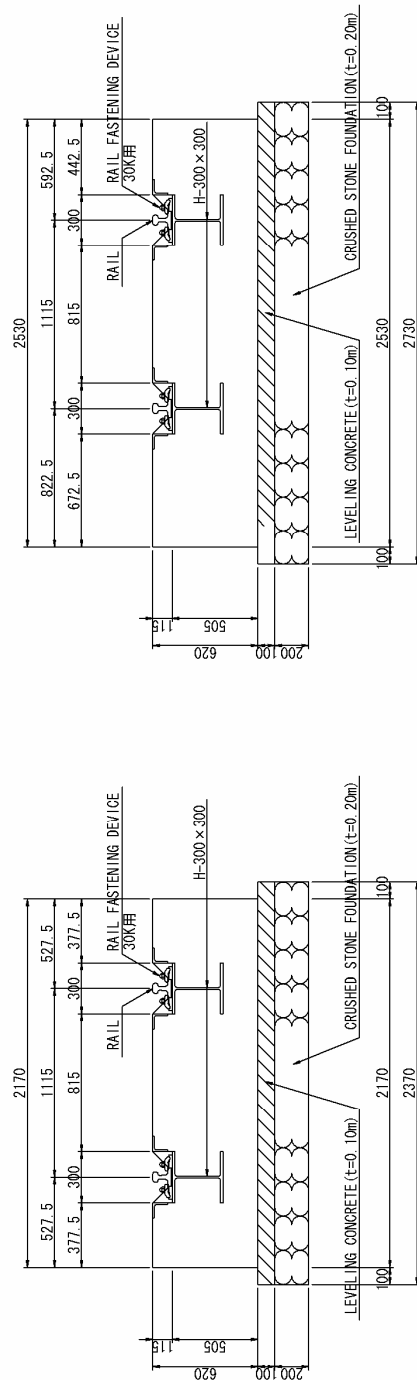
(11) Yard Concrete Pavement Structure in Port of Lobito
